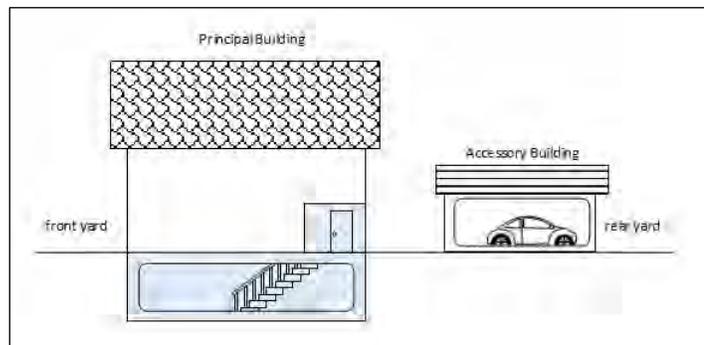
ACCESSORY DWELLING UNIT WITHIN A PRINCIPAL BUILDING.
